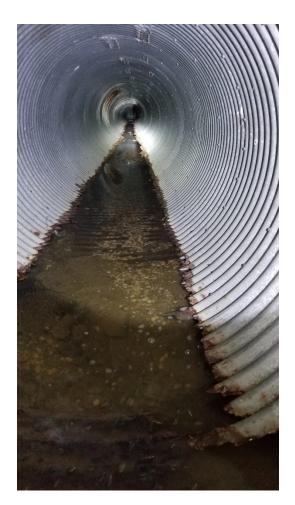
(5/28/21) – Looking down stream from The curb inlet. NOTE: bottom of pipe is completely Rusted the entire length.
